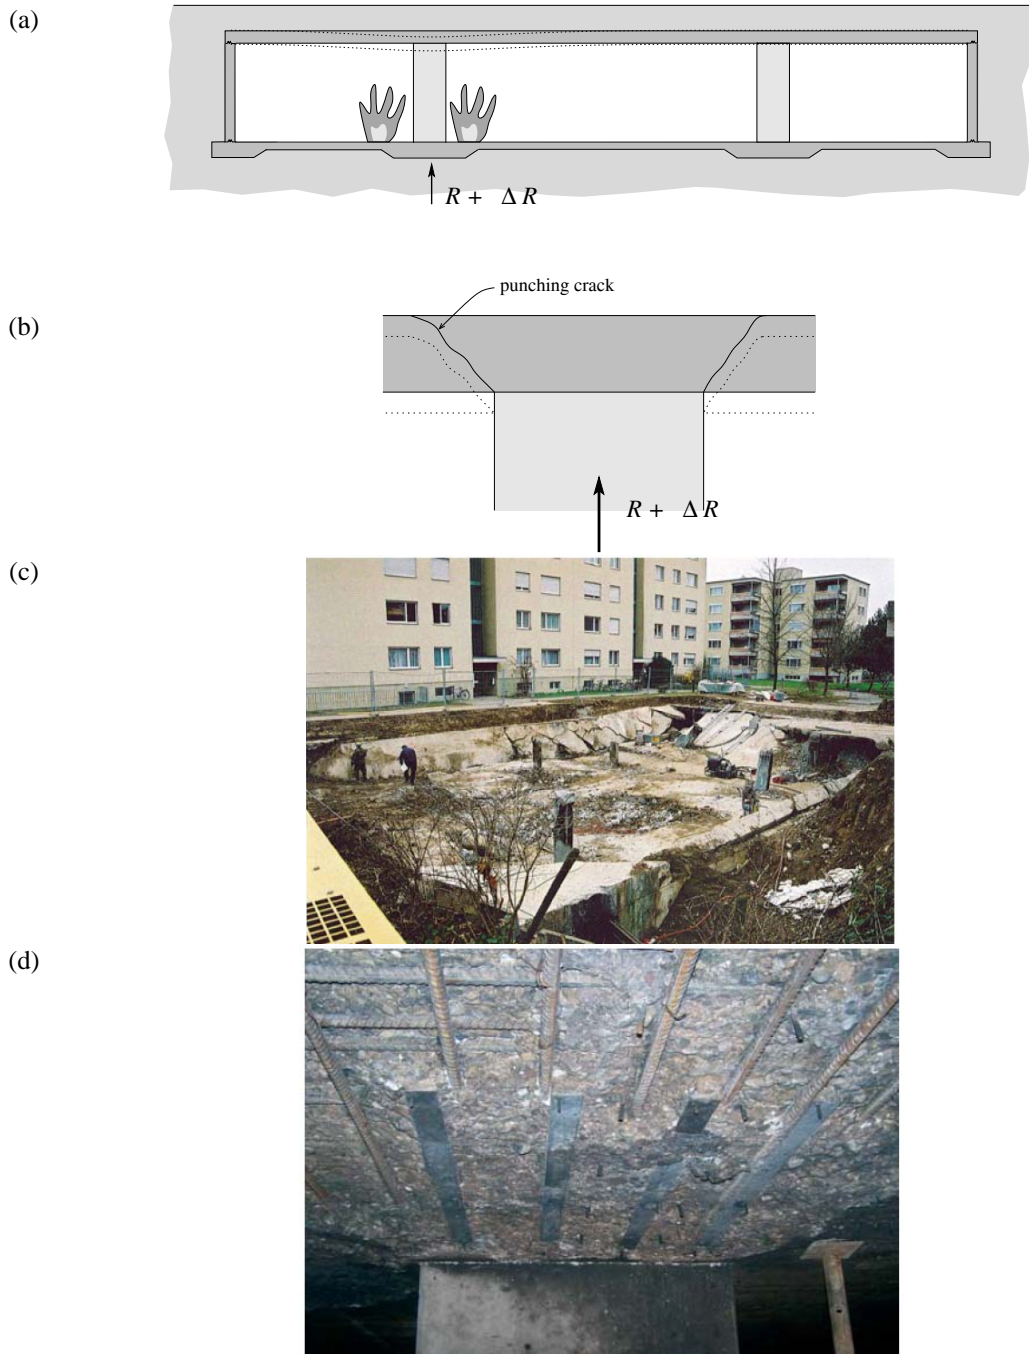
Punching failures in flat slabs subjected to fire (photos courtesy of prof. A. Muttoni): (a) increase of the reaction force due to redundant forces; (b) development of punching crack; (c) Gretzenbach flat slab collapse; and (d) Jonen flat slab spalling
